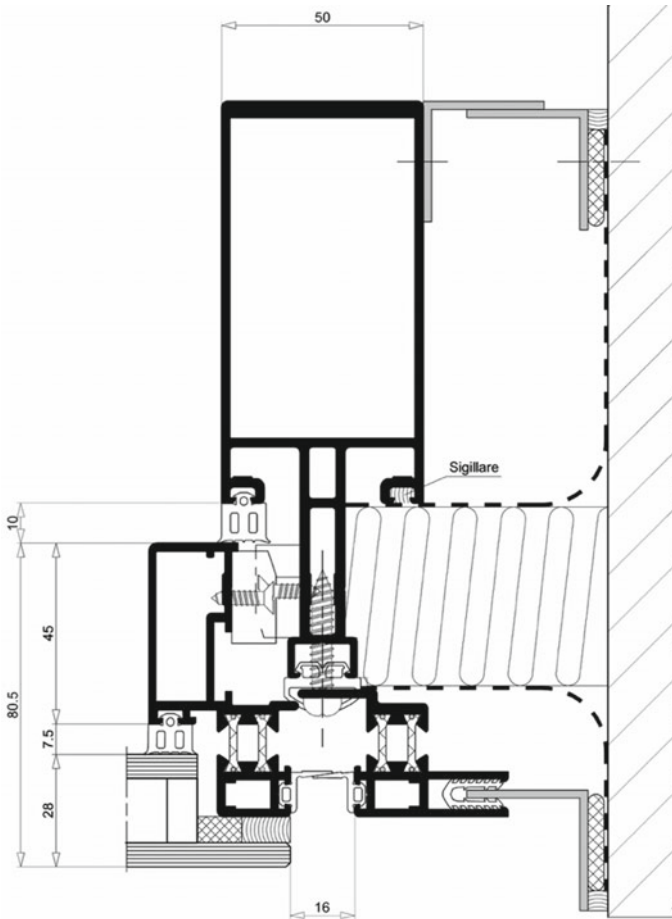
Lateral aggregation of the mullions, without the frame profile towards the wall, that provides for the insertion of the internal waterproofing sheathing, according to the fastening to the cavity housing the internal seal and the fastening to the wall surface (via angle profile), and the insertion of the external waterproofing sheathing, according to the fastening to the wall surface via angle profile, aggregated to the cavity extended beyond the laying profile. © Courtesy of Metra
